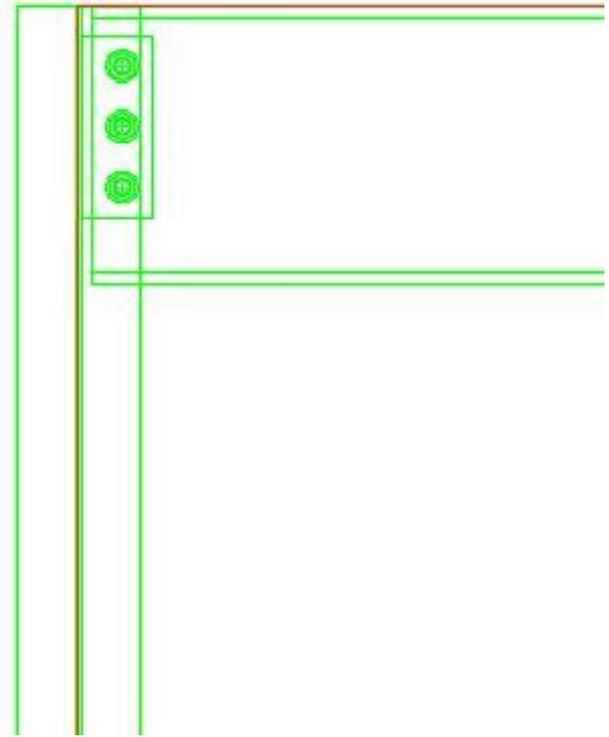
Analysis of shear plate connection in 2D wireframe(Elevation) when connection is safe.
